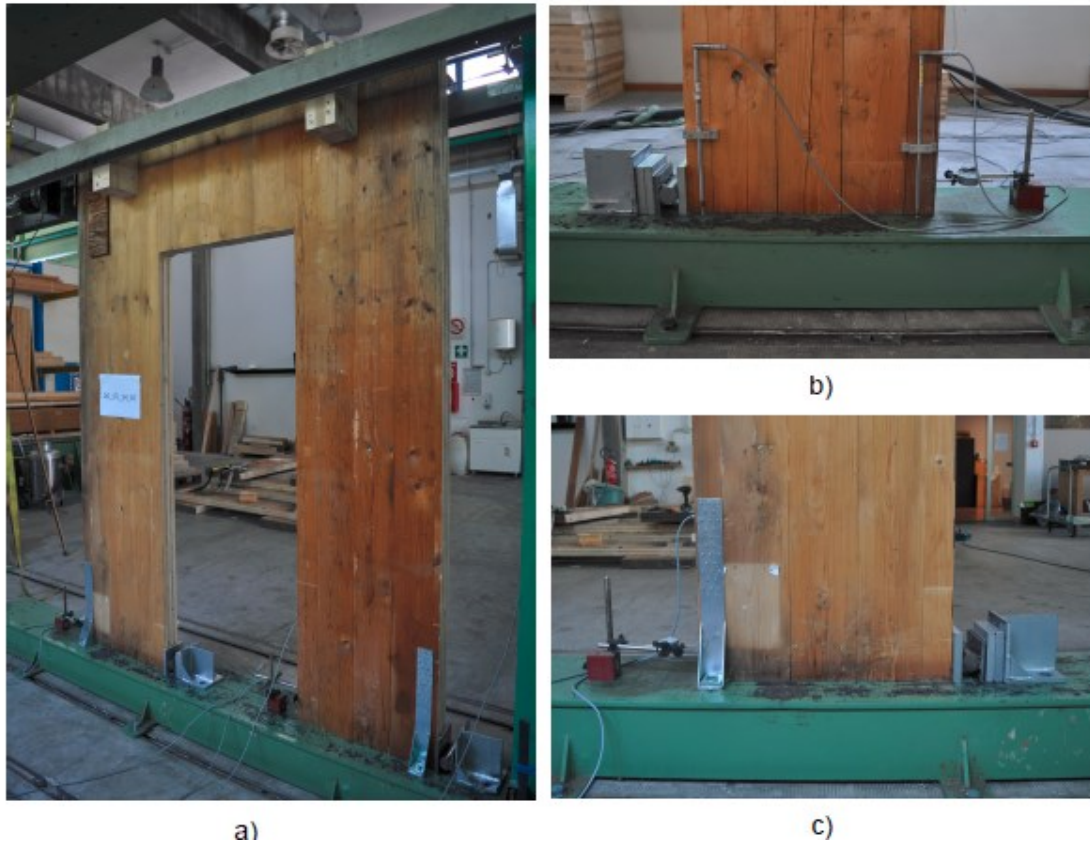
Geometric configuration, connection system and monitored displacements of shearwall 01, a) picture of the wall, b) LVDTs placed at the two extremities of right wall segment and c) zoom in of WHT440 hold-down connection at the right wall segment of the wall
